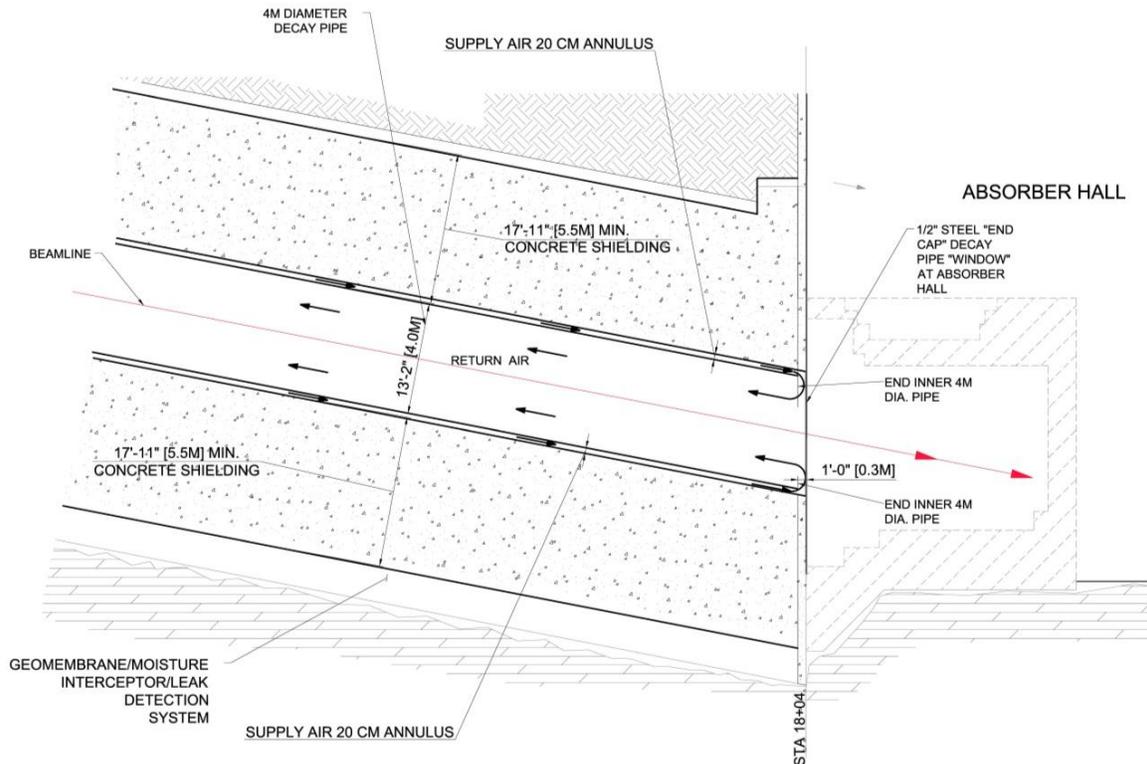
Longitudinal section of the Decay Pipe at Absorber Hall.
